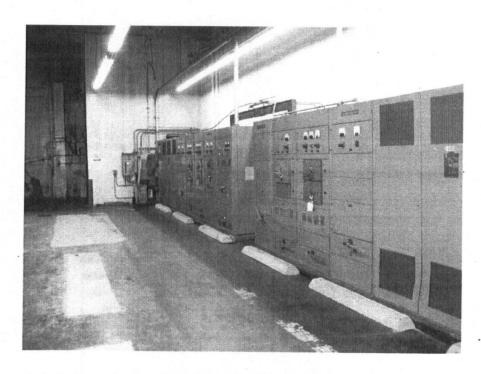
Facing west; view of the elevator mechanical room on the roof of Building 5A.
